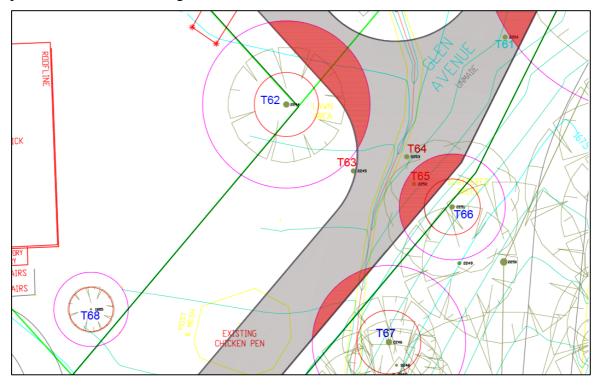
Construction of new roadway adjacent trees 62, 66, 67 and 68
